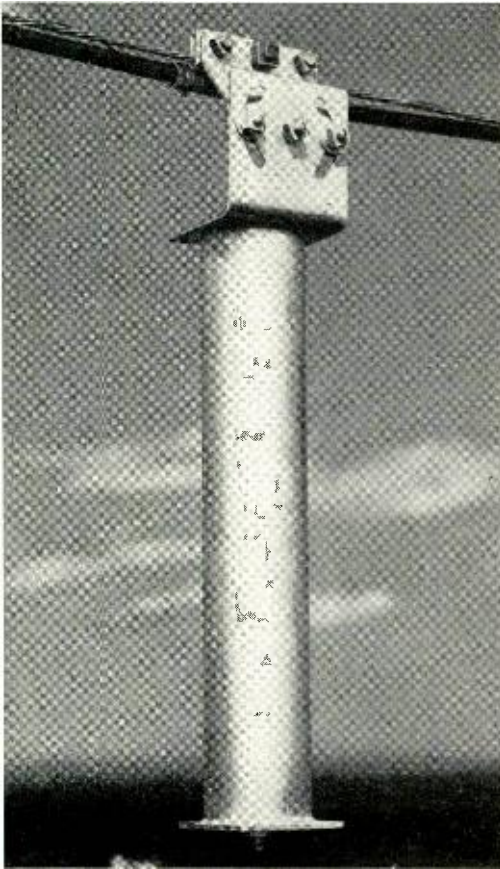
B cable damper is bolted to strand, then adjusted to hang vertically.
